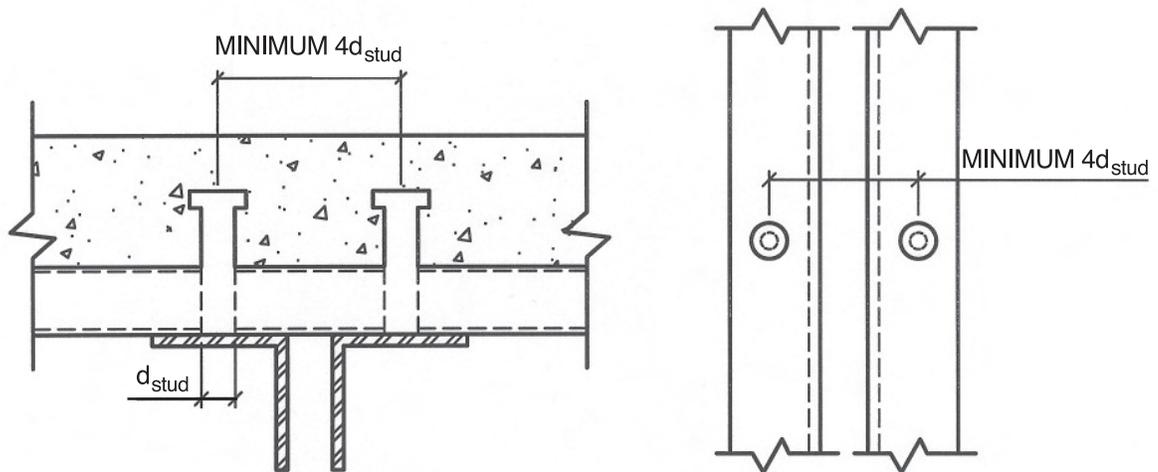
MINIMUM TRANSVERSE SHEAR STUD SPACING
